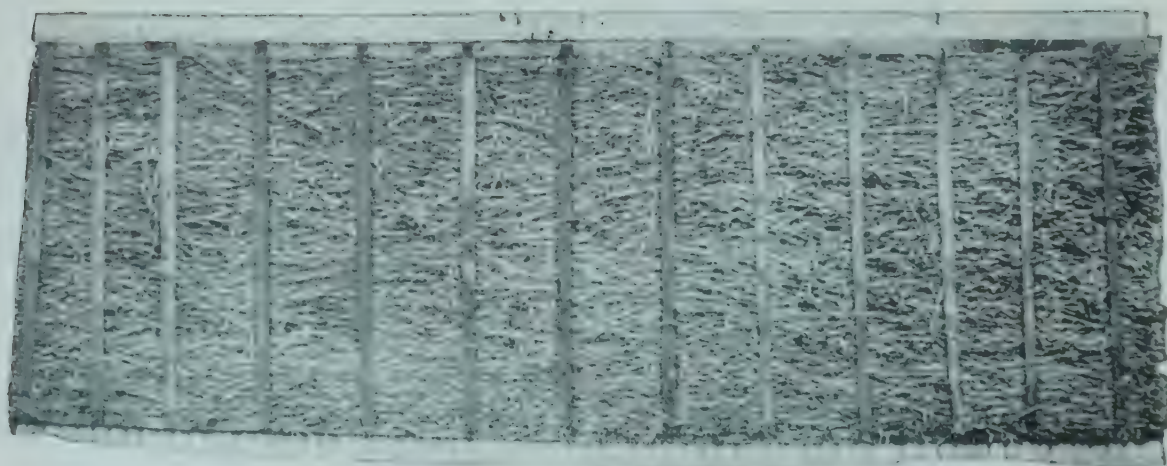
A Shelter Roof made of corrugated iron sheets thatched with straw on the under side.
